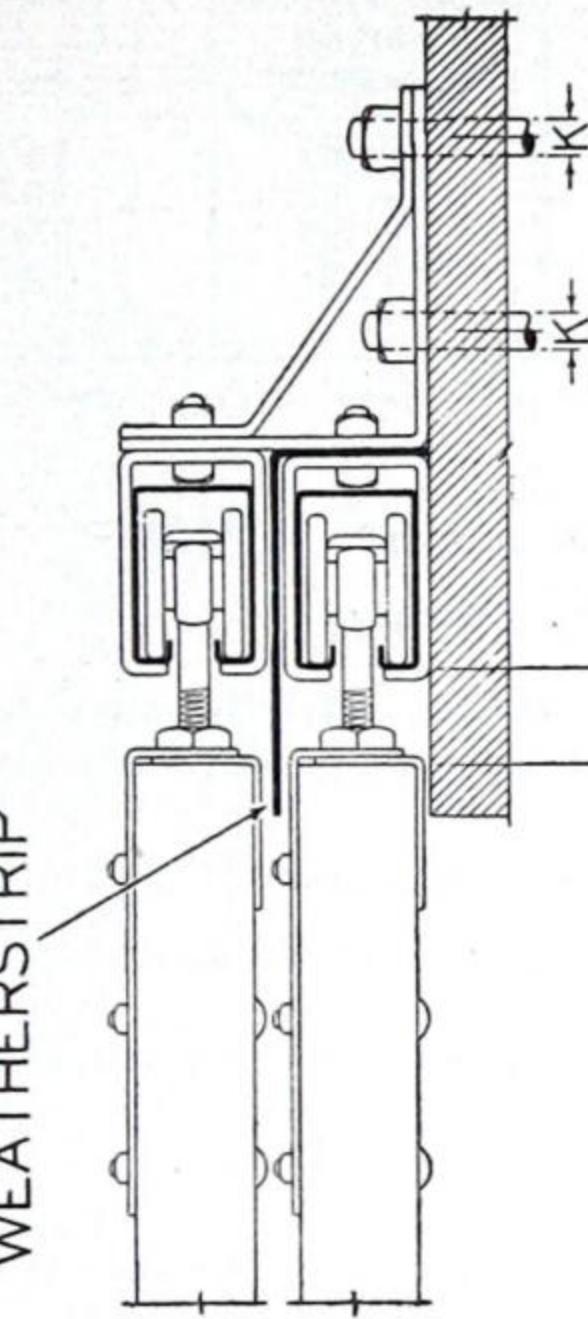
Cross-section showing wall bracket attachment, with weatherstrip, of two parallel sliding doors. See page 96 for dimensions.
